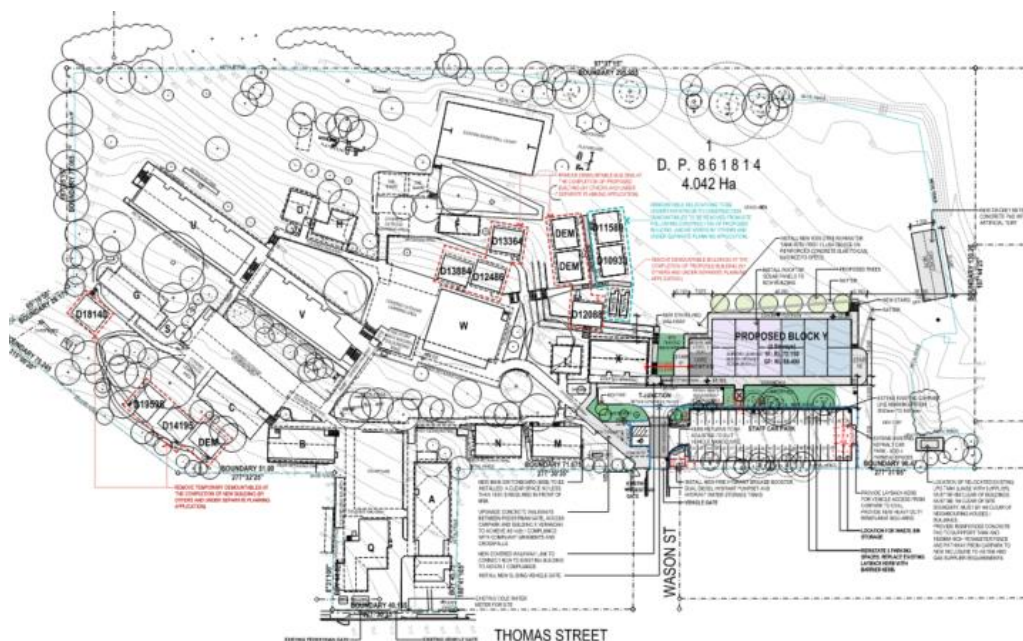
Site Plan [Source: Fulton Trotter, 2025]
